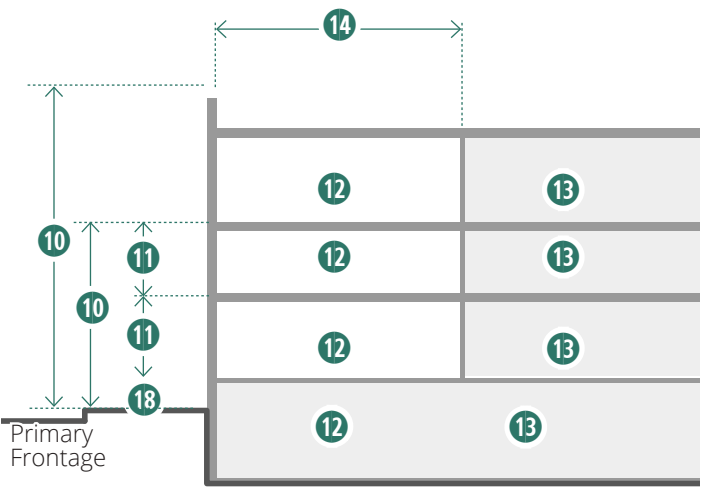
G-2. Workshop Building: Height & Use Requirements
